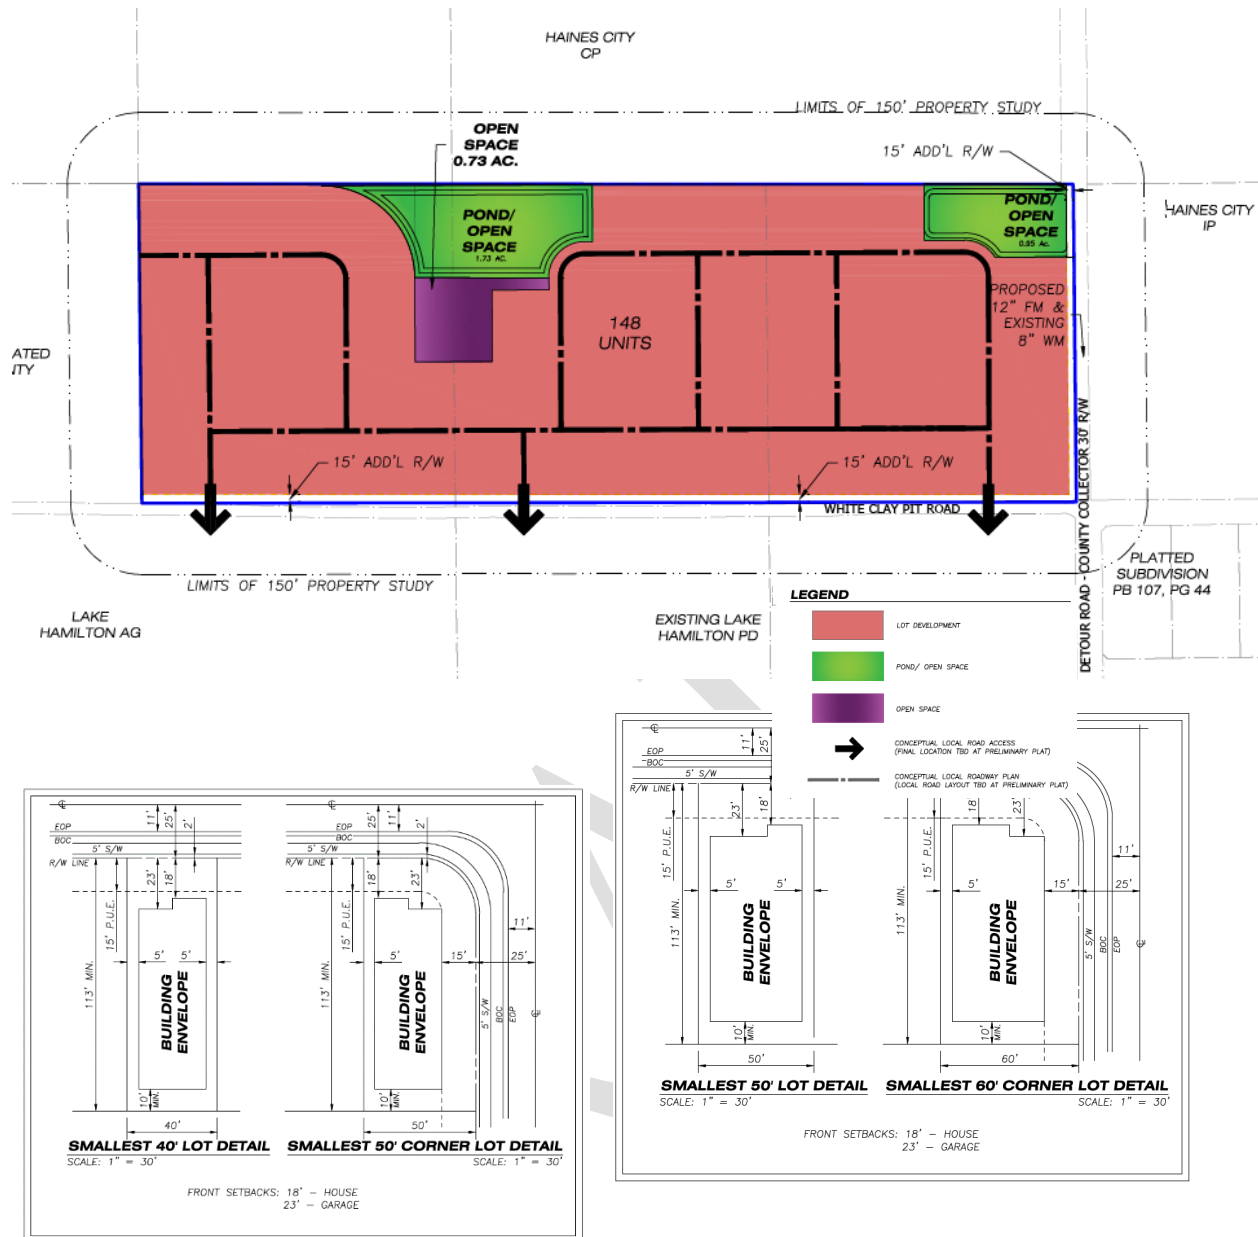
EXHIBIT CSITE PLAN STANDARDS NOTES:
